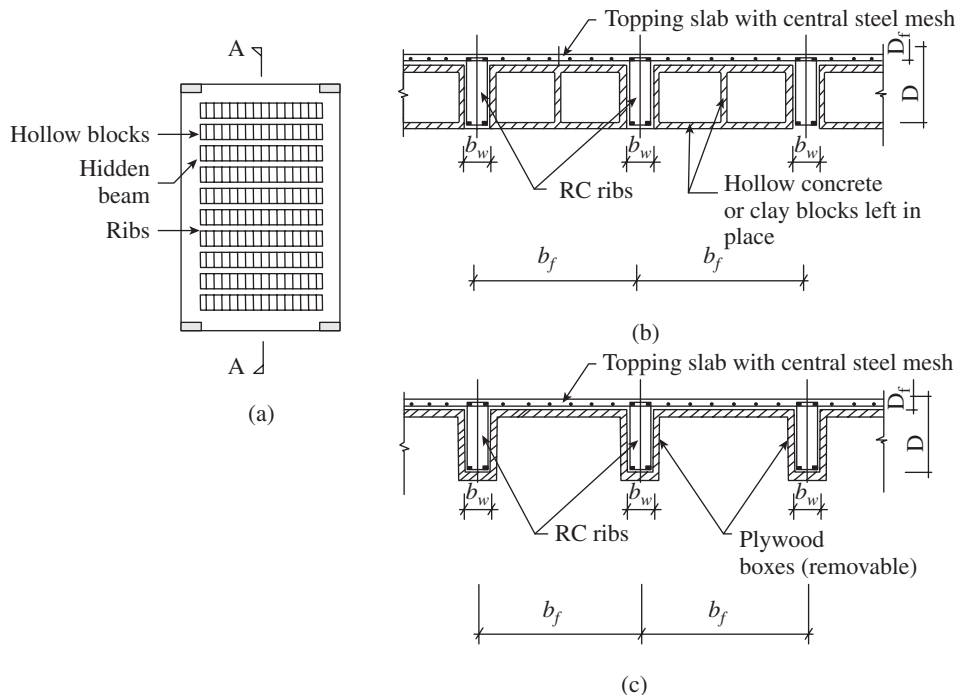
One-way slab with hollow blocks (a) Plan of slab (b) Section A-A (c) Section A-A for slabs with only ribs
